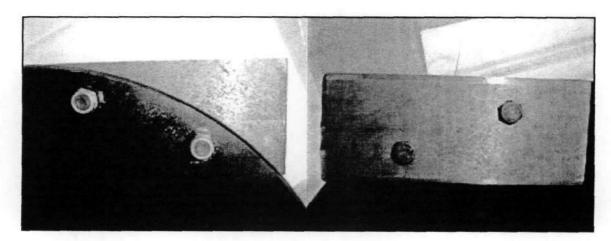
Top (left) and bottom (right) view of the bolt connectors on the plate
